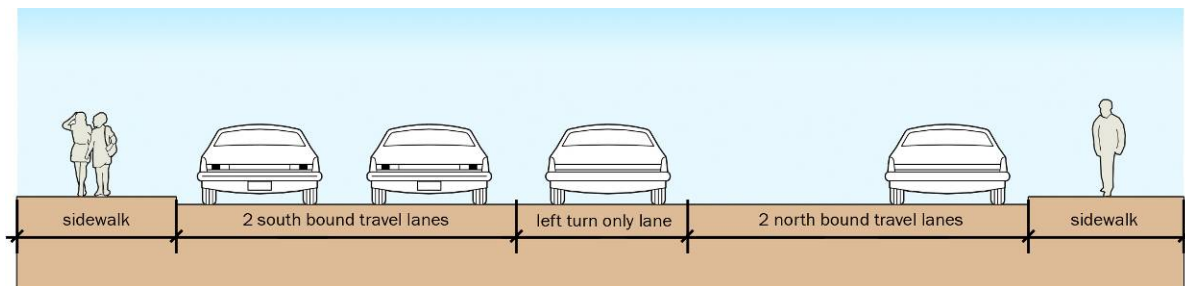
Exchange Boulevard Typical Section (Court Street to Broad Street)
